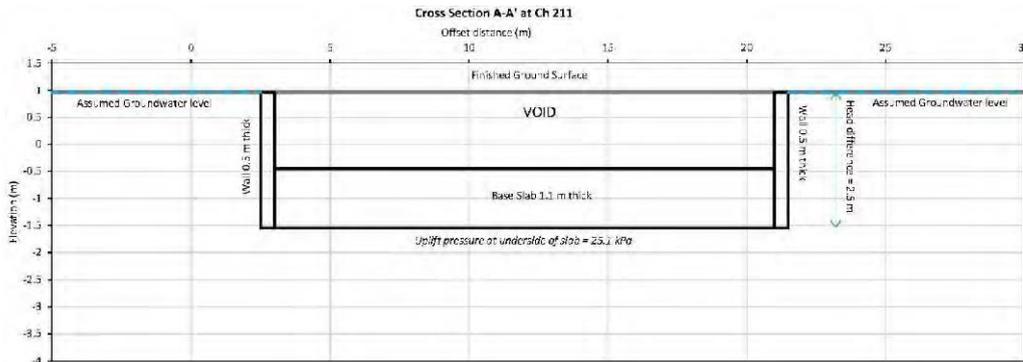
Typical cross section (based on Ch. 211) assumed for uplift assessment
